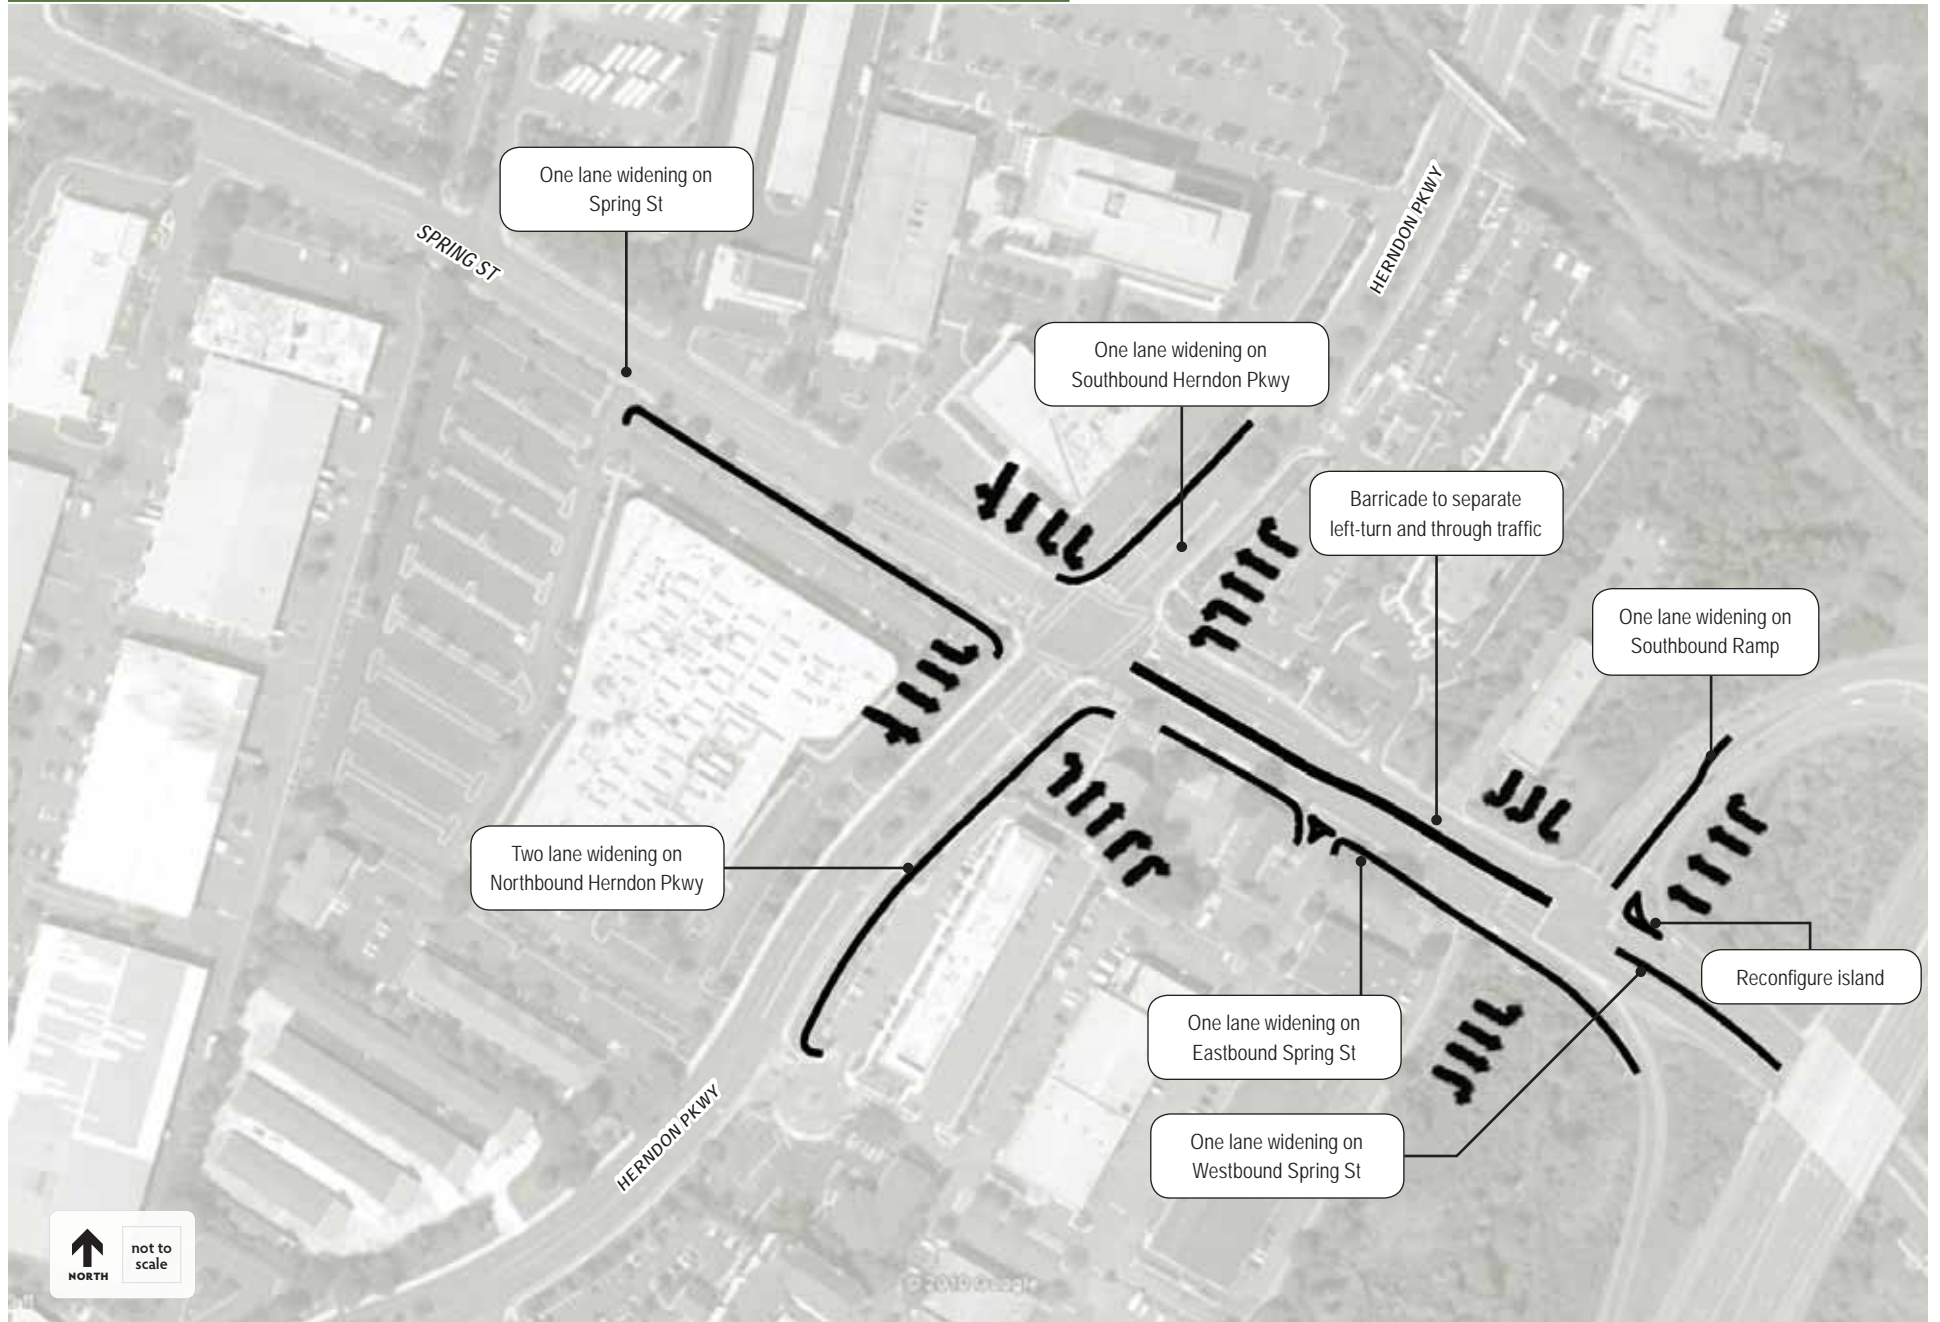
| Herndon Transit-Oriented Core Plan—Transportation Improvements (West)
